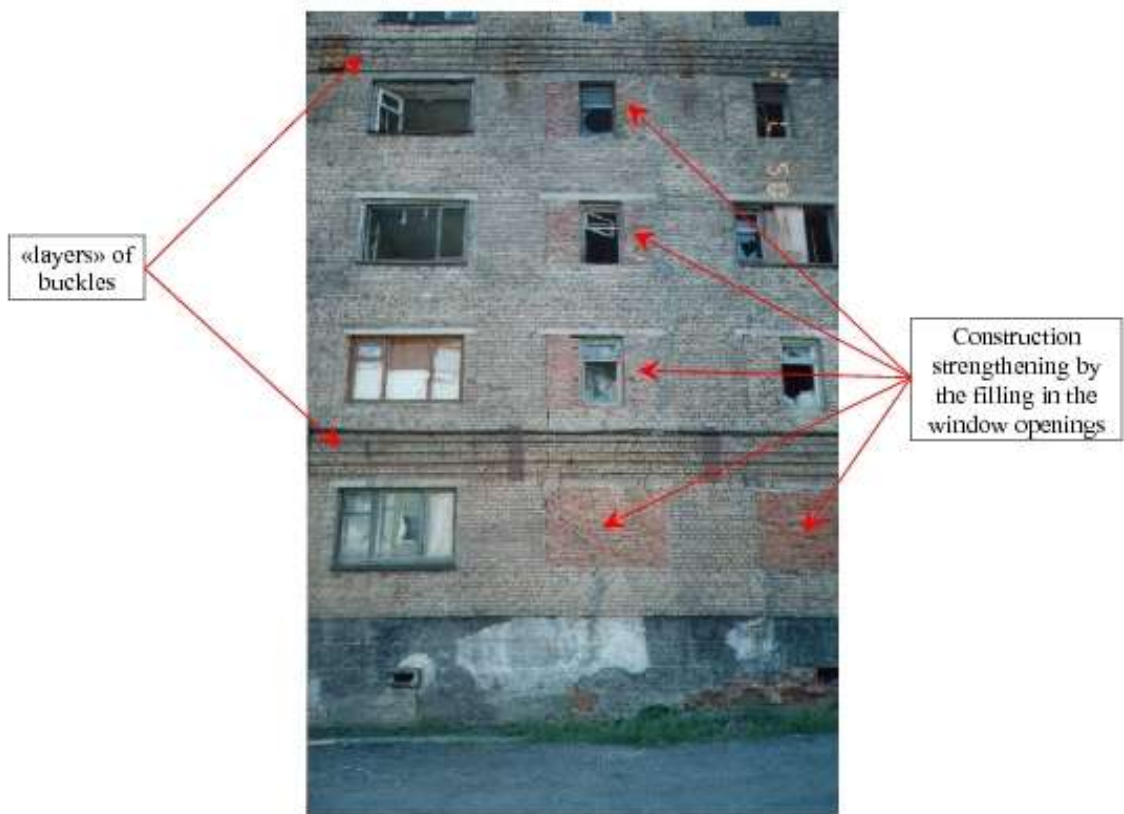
Emergency house №13 (fragment) on Lermontov street in Vorkuta
